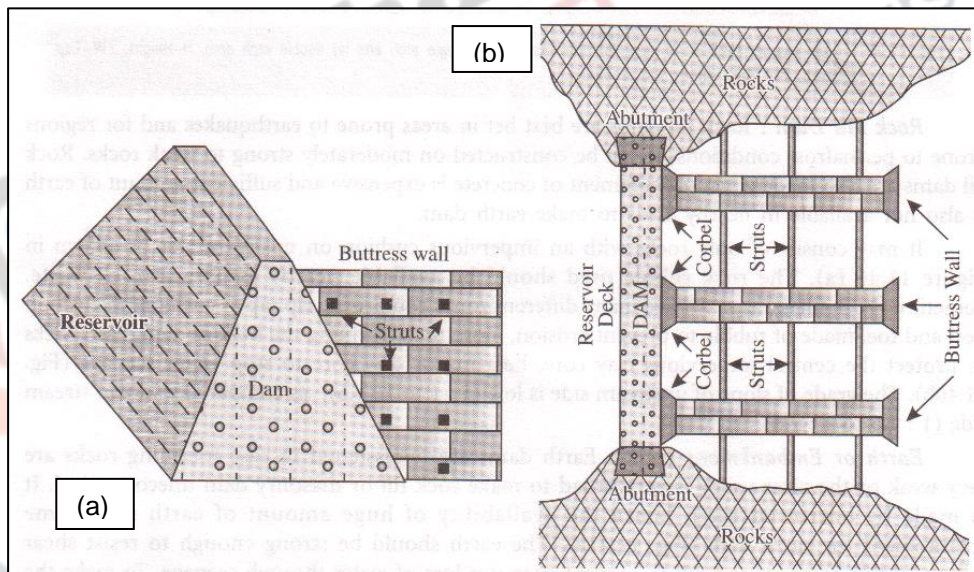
(a) Cross sectional view of a buttress dam showing main dam with deck and buttress wall. (b) Plan of buttress dam, showing main dam with abutment, corbel, buttress walls and struts.
